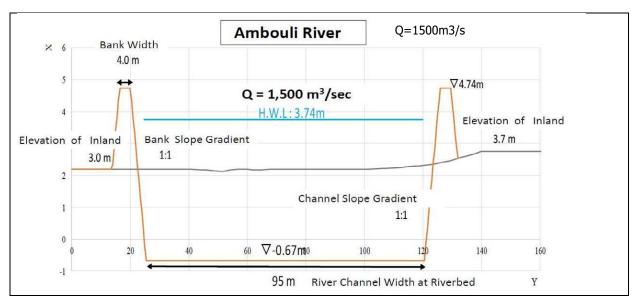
Typical Cross Section (Main Stream Improvement Plan, Q=1,500 m3/sec)
